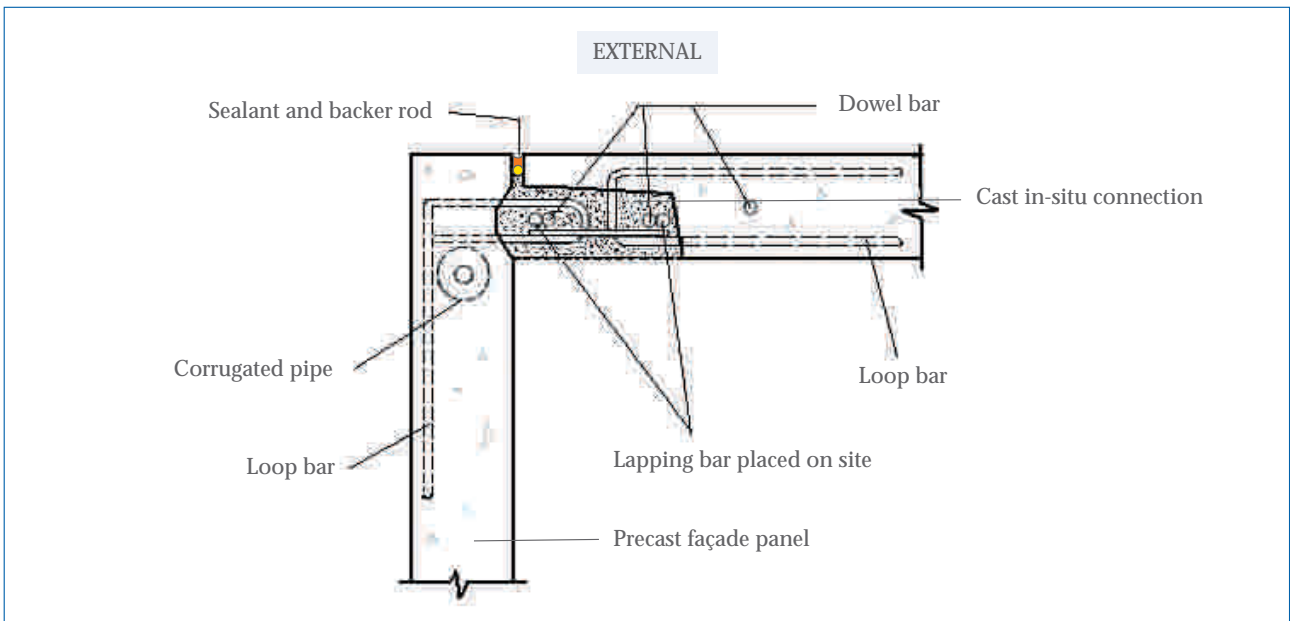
Typical details for corner joint between precast panels (plan view)
